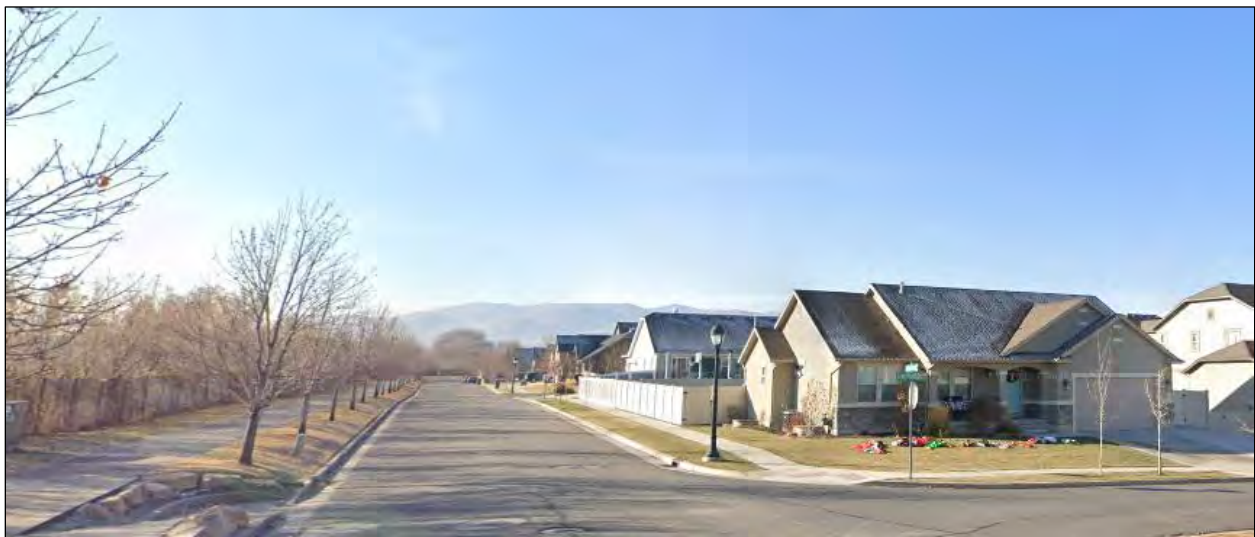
Proposed Station Area Looking Southeast from Royal Coachman Drive
